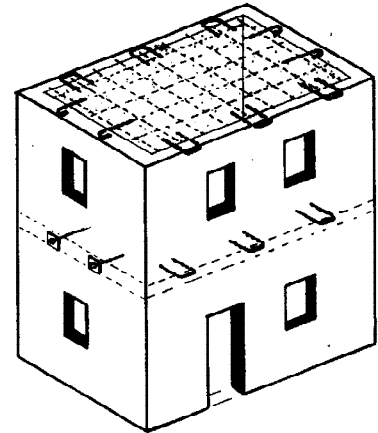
Wall-slab connections with reinforcing bars, tied to brickwork.
